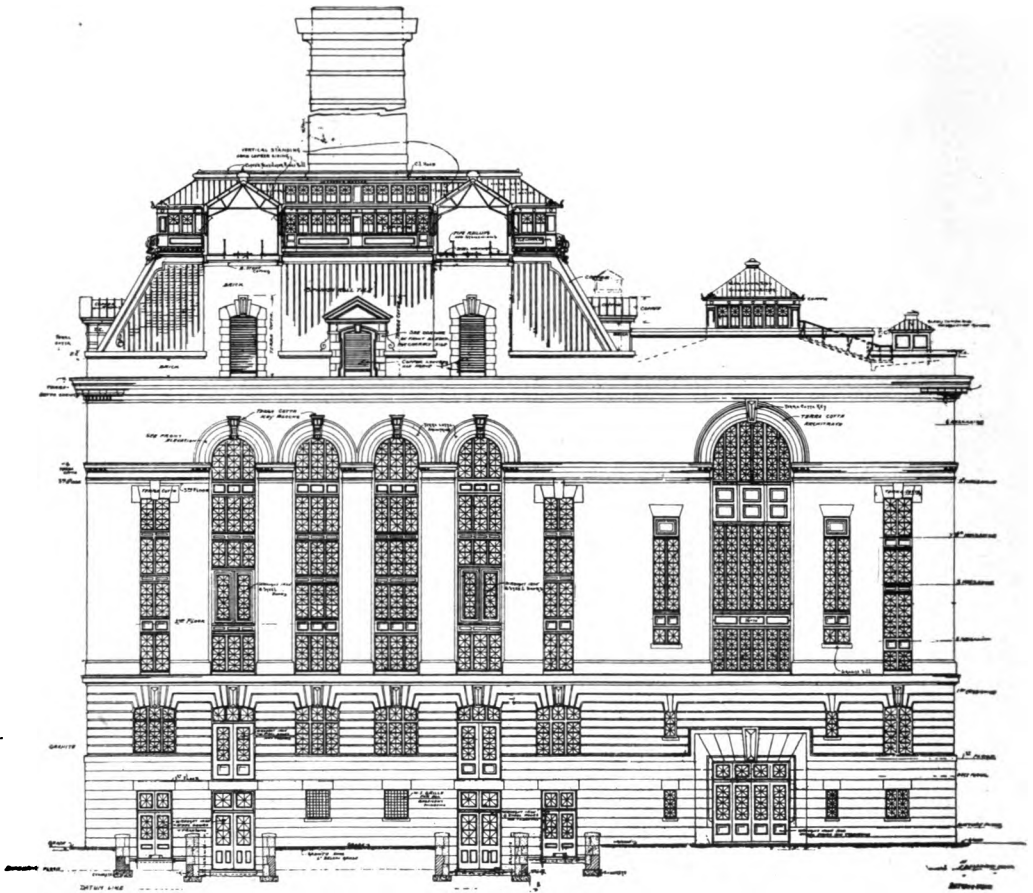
Rear Elevation, River End, Waterside No. 2.
